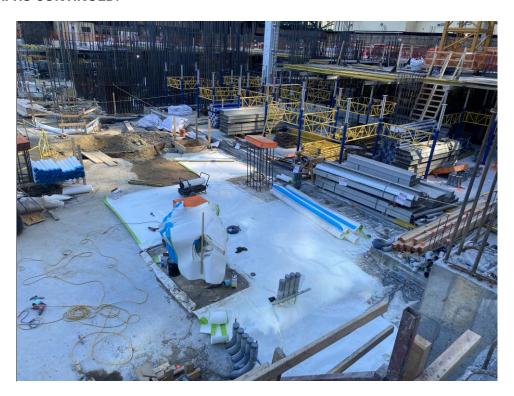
ECD installing waterproofing in the eastern part of the site (facing northwest).
